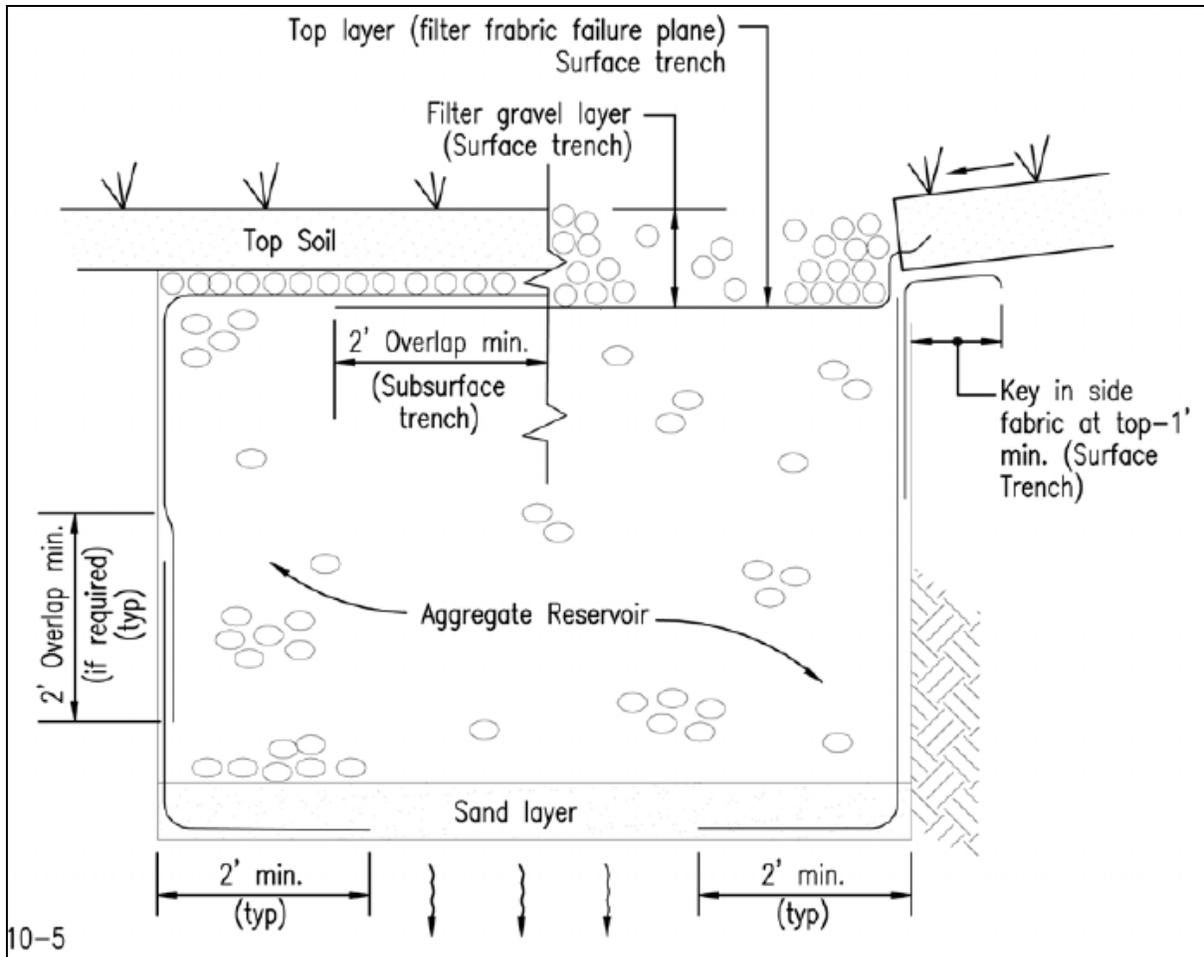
DCR/DEQ Infiltration Trench Filter Fabric Installation
